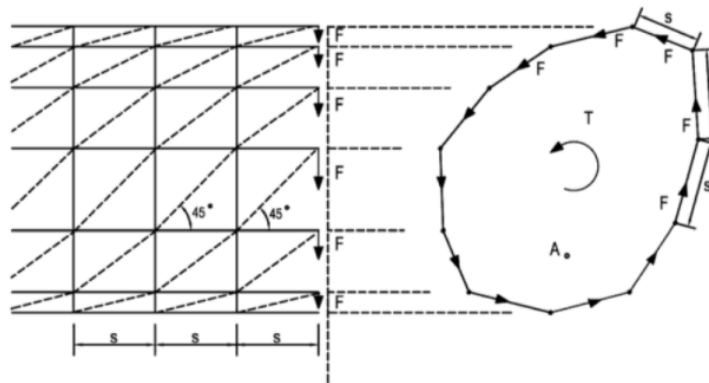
Schematic of Rausch space truss concept, from [Hsu (1984)]
